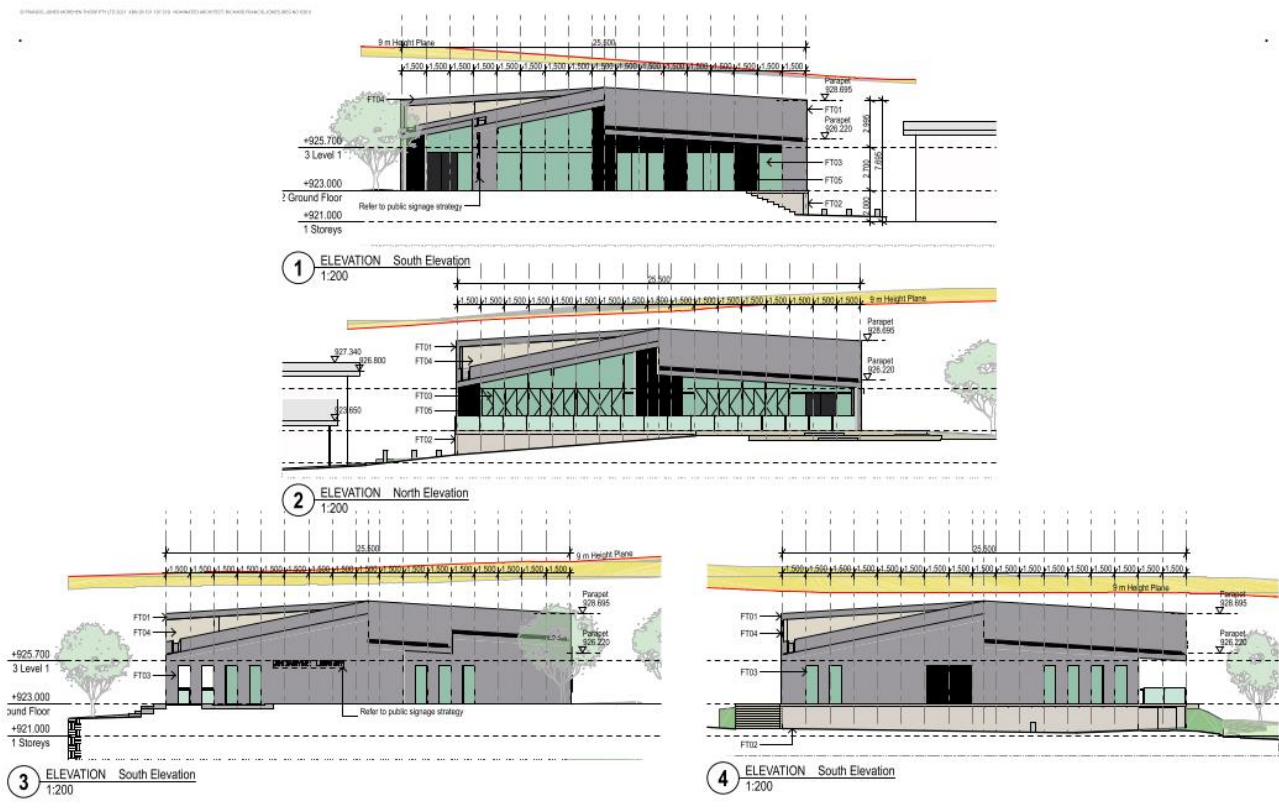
Elevations of the proposed building displaying the architects interpretation of “Alpine Style”
